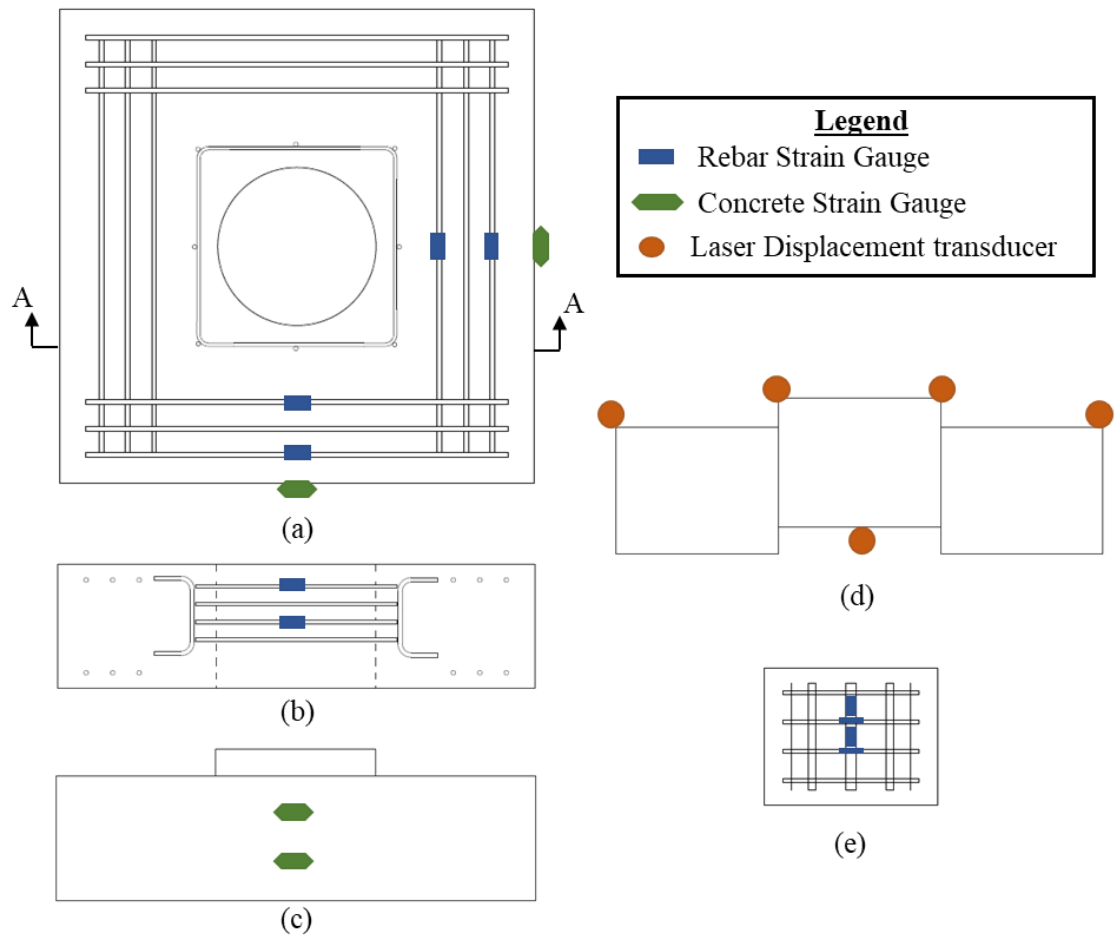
Instrumentation scheme for larger plug specimens: (a) pile cap bottom view, (b) section A-A, (c) cap elevation, (d) specimen elevation through centerline, and (e) plug reinforcement detail.
